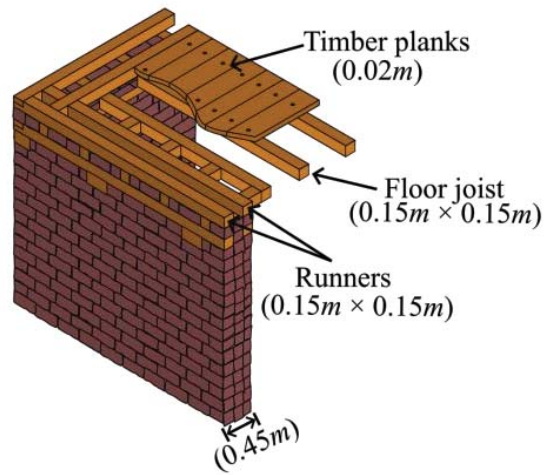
Typical sketch of the floor systems in Taq buildings
